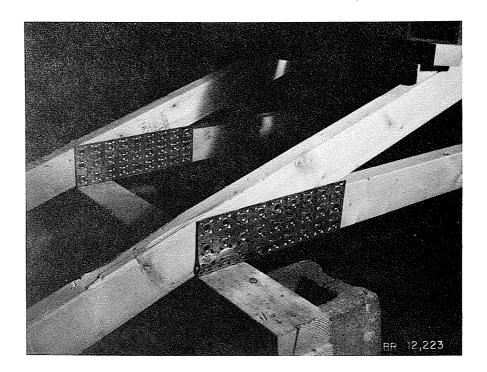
Plate failure at heel of "W" trusses made with light-gauge plates
